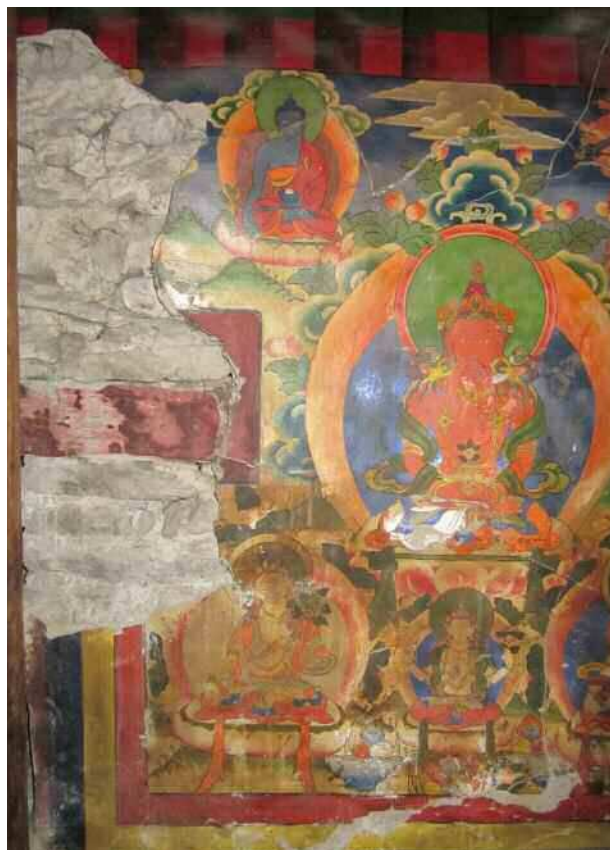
The walls of the building are bowing under the weight of the roof, causing original Thangka murals to crack and decay from the walls.
